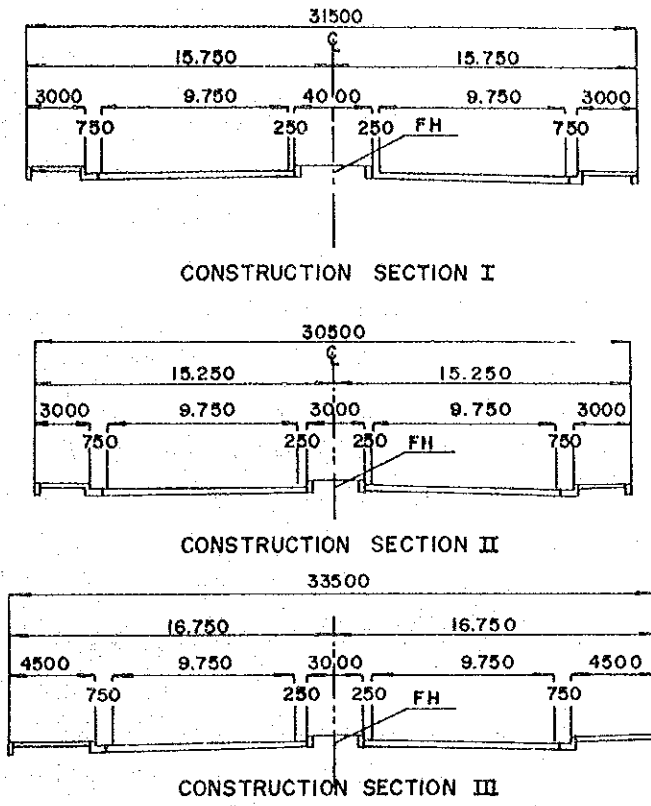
CALLE 30 TYPICAL CROSS SECTION
